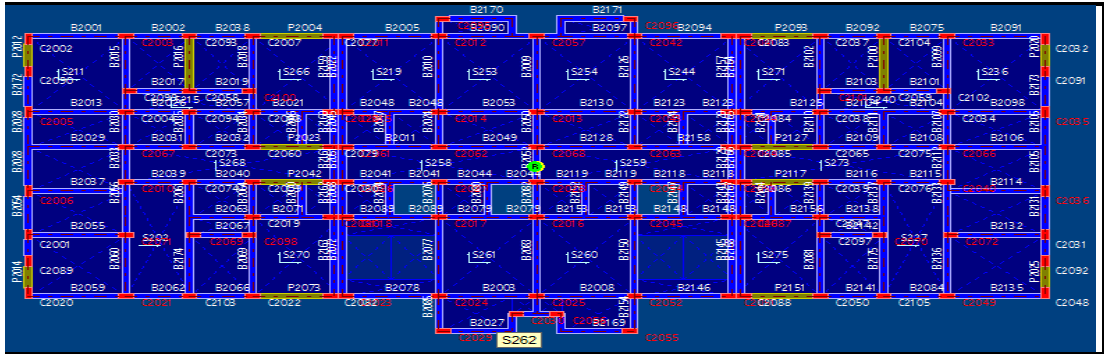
Plan of Fifteen Stories, Shear Wall System
